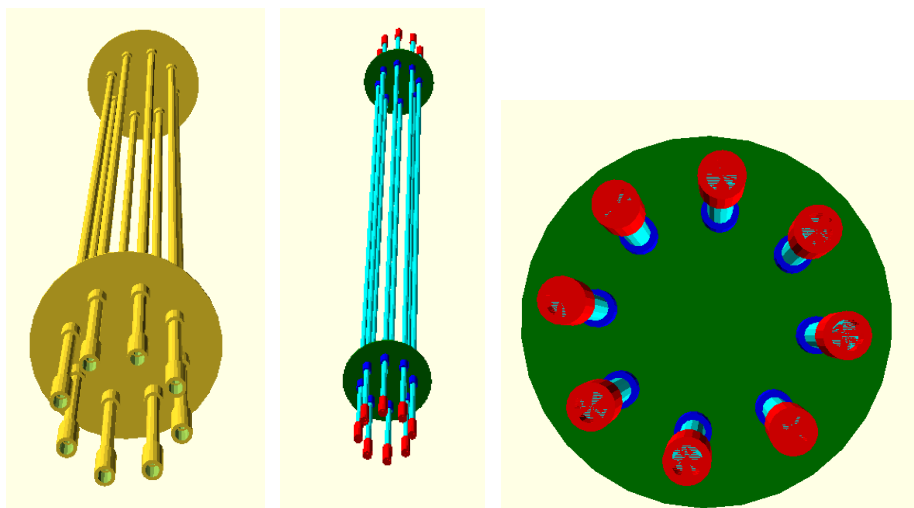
(Left) 3D drawings of possible passage through FEB-090 shielding wall. (Right) Front view of the pipes passage through the shielding concrete of FEB-090.
